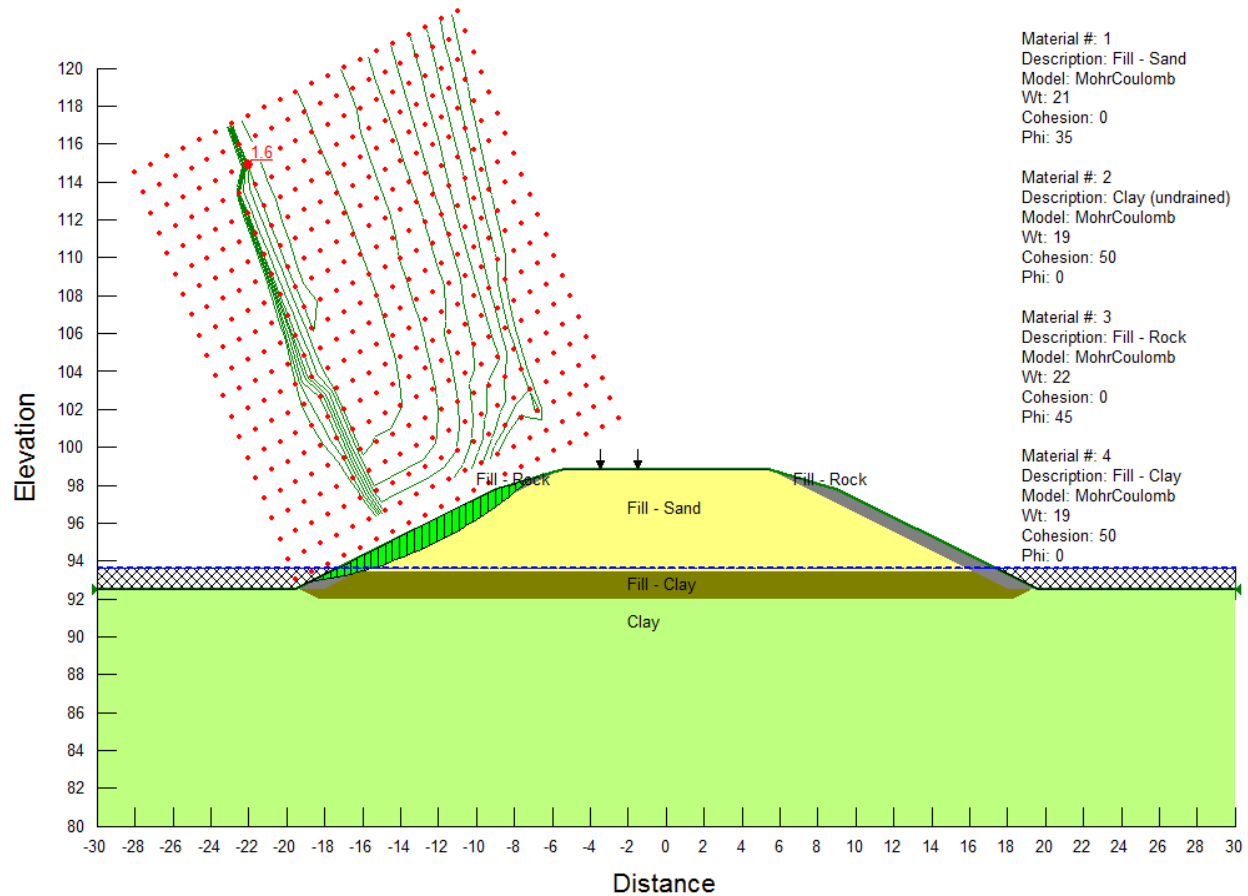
Slope stability analysis reinstated southbound lane embankment after culvert replacement, 2.0H:1V rock fill foreslopes under undrained condition
